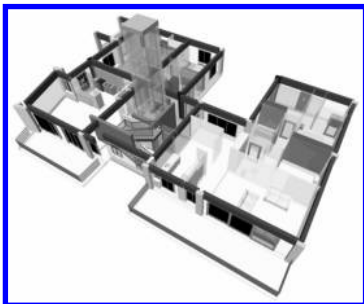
BIM/ABV integration—3D rendering of building floor showing floor's damage state (darker colors indicate greater damage).
